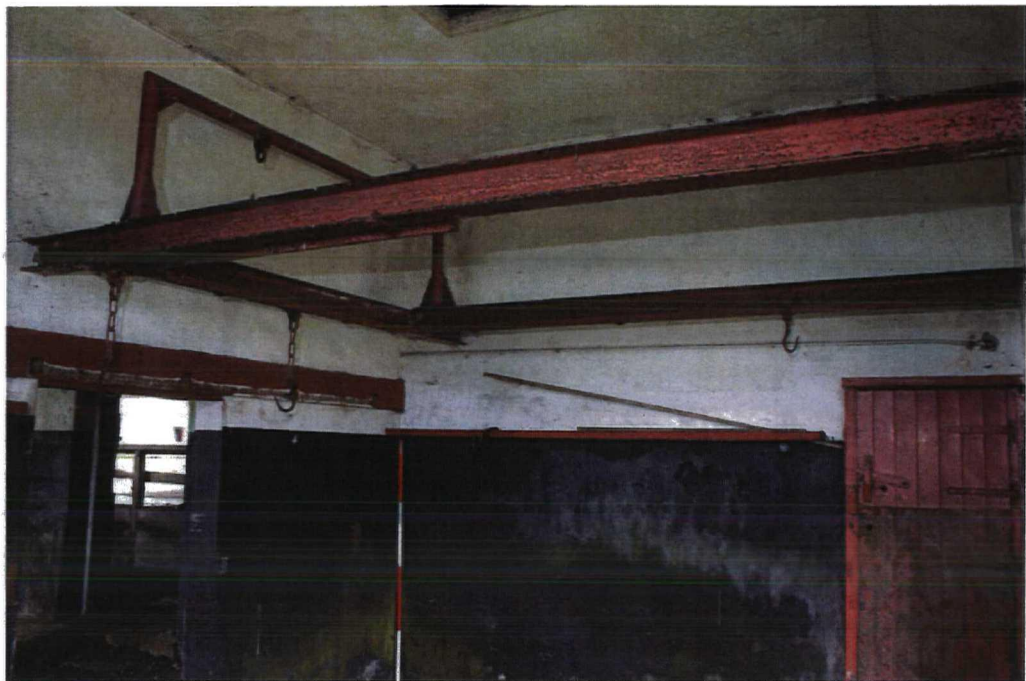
Building 10, the northernmost slaughter room and some of its fittings. Looking S
